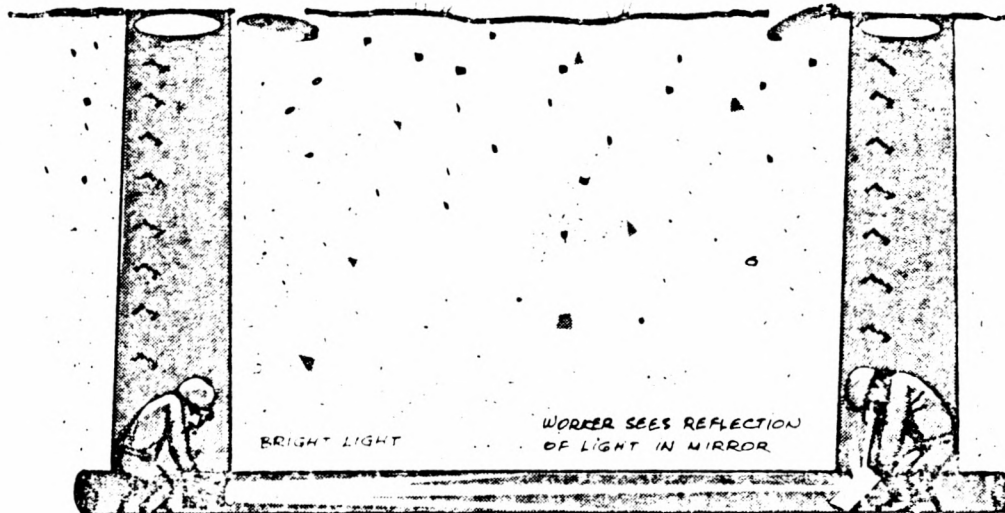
Inspecting a Sewer Line by Lamping
